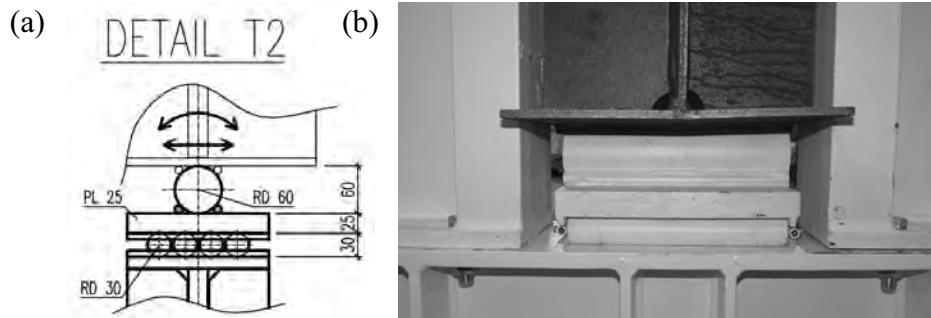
Sliding articulated support: a) construction detail, b) side view of the finished support
